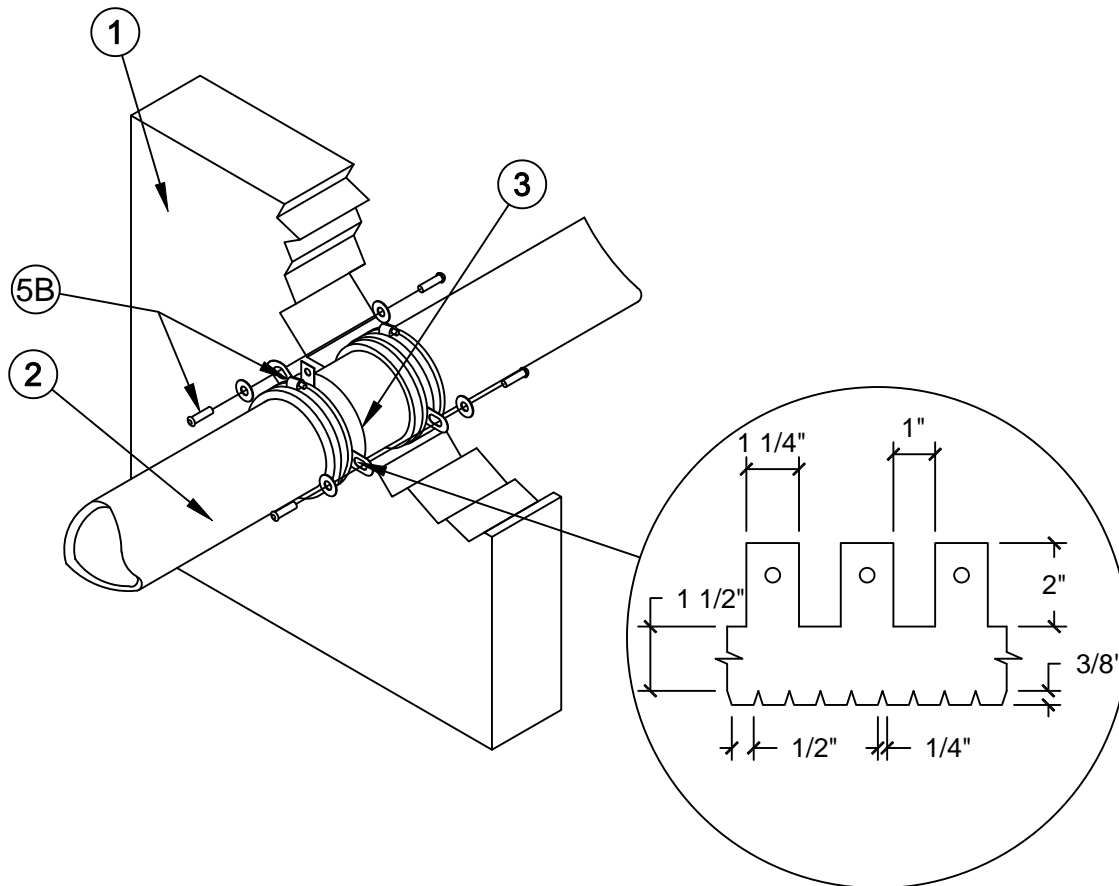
Optional Steel Collar and SpecSeal RED2 Wrap Strip with hose clamp.
